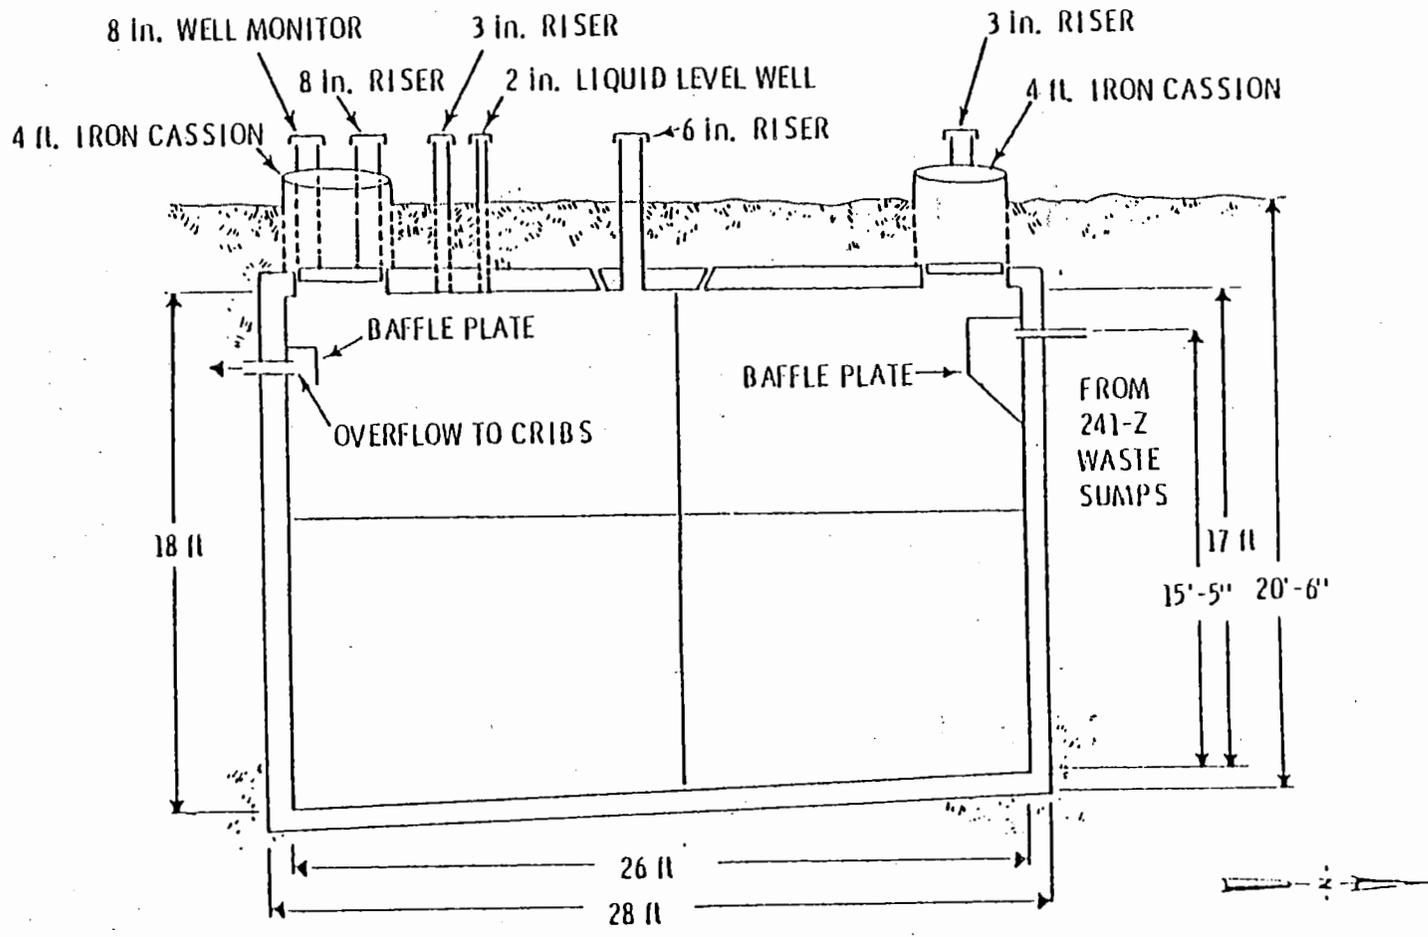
Elevation View of 241-Z-361 Settling Tank.
